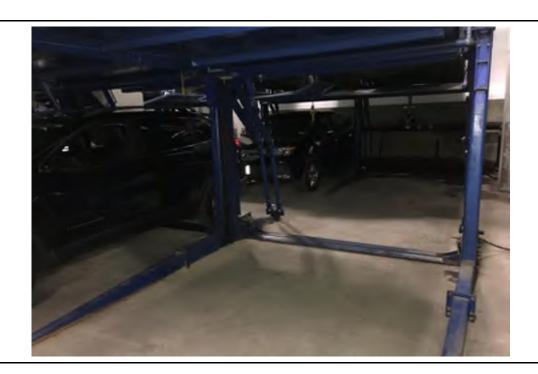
Subgrade parking garage concrete slab, facing north. 30 March 2021.
